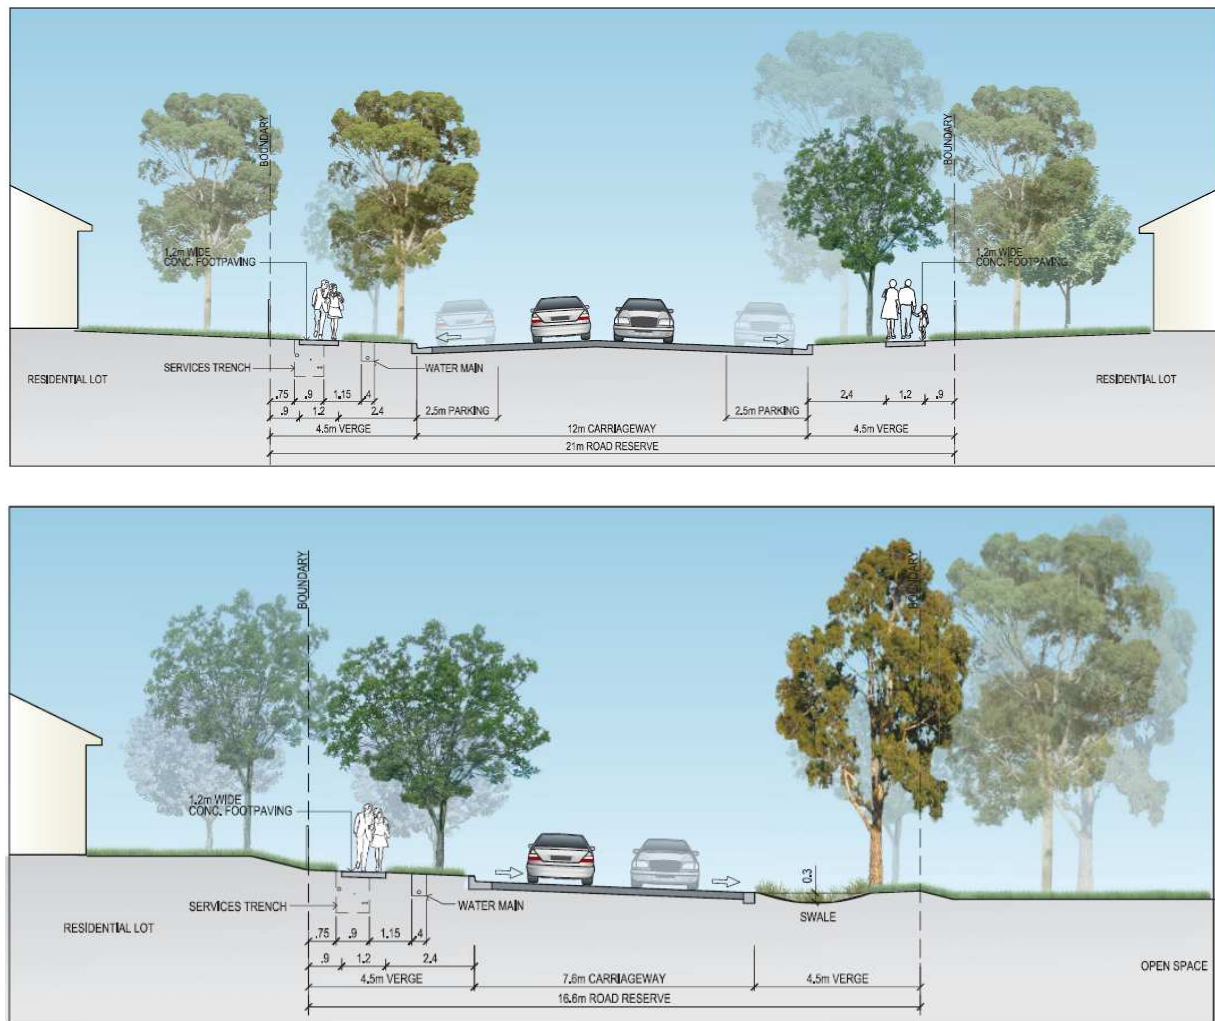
Cross sections proposed for Road 1 (top) and Road 6 (bottom)
